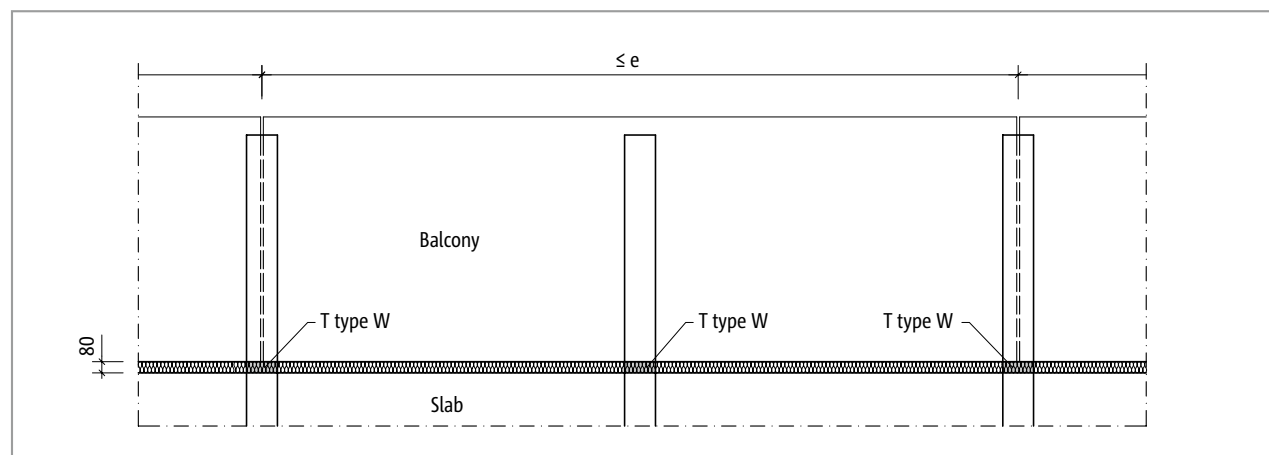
Schöck Isokorb® T type W: Expansion joint layout
